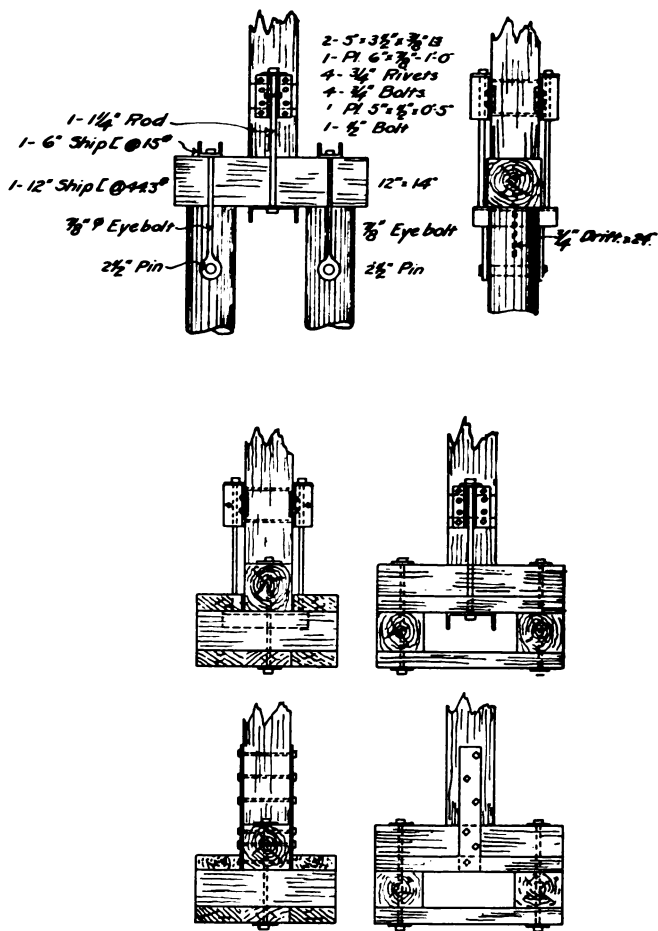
, 95, AND 96. TYPES OF COLUMN-ANCHORAGES.
